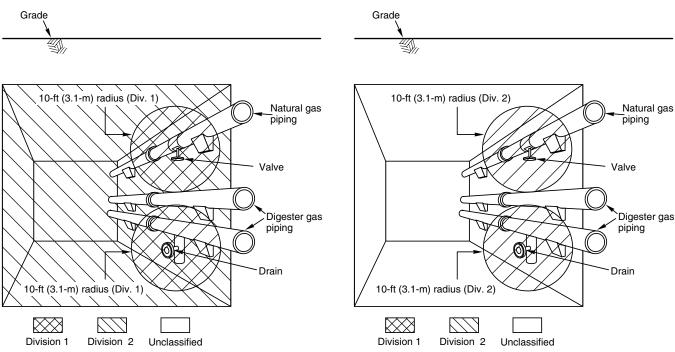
(f) Underground tunnel containing natural gas or sludge gas piping with ventilation D; illustration of Table 4-2(a), rows 20a and 20b.
